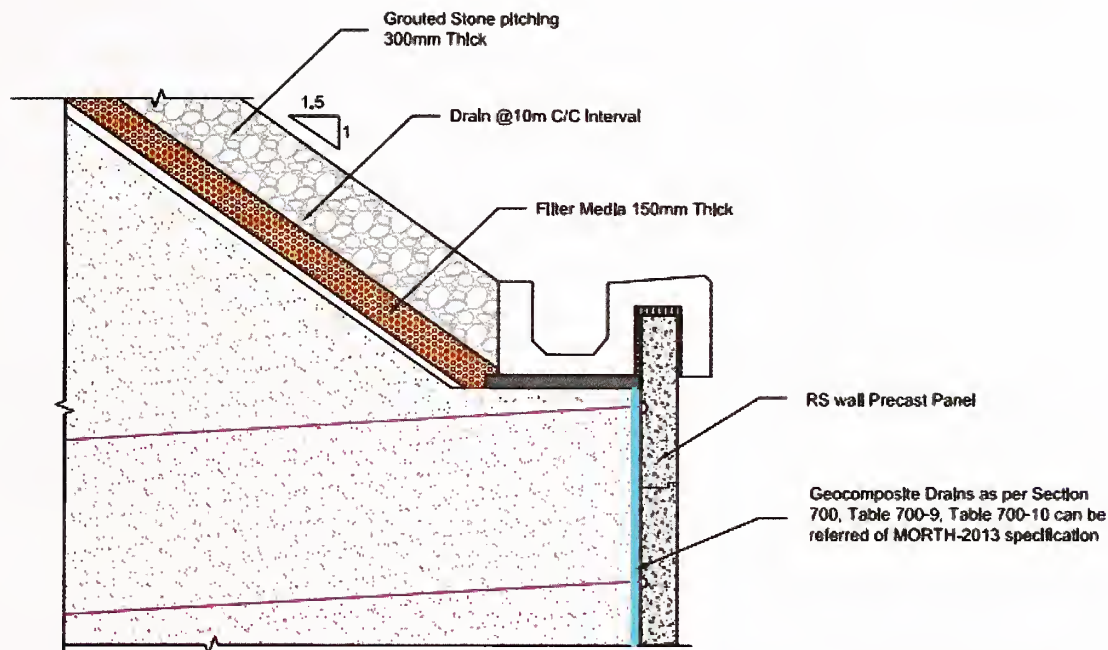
(b) Drainage Arrangement at the Top of Wall – Part Height Wall
